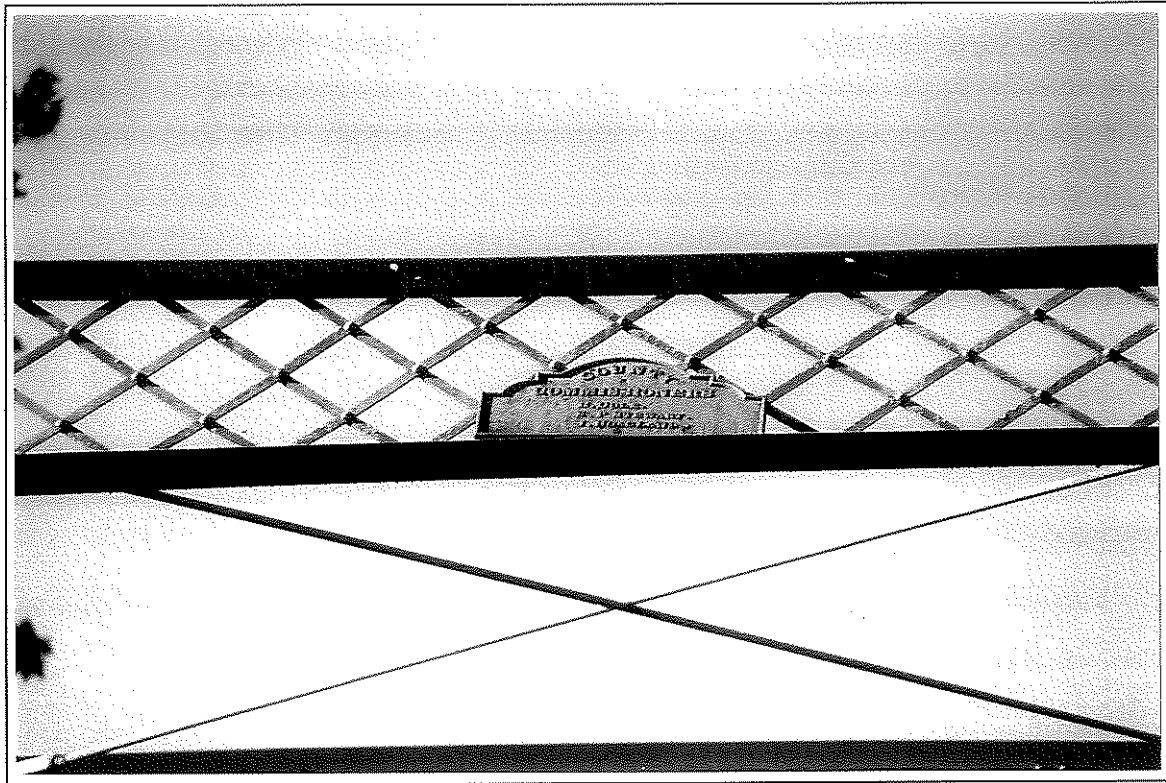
Detail of an exterior upper panel point detail, facing north.
